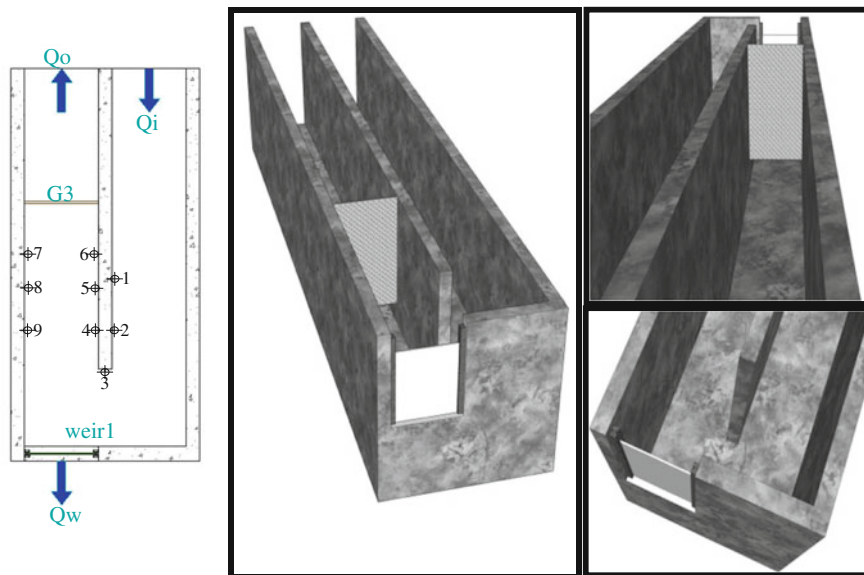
Study zone. Measurement points in 2D drawing (left) and 3D drawing (right)
